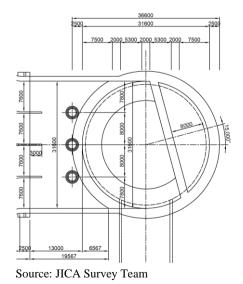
Plan Drawing of Outlet Vertical Shaft, Parañaque Spillway
